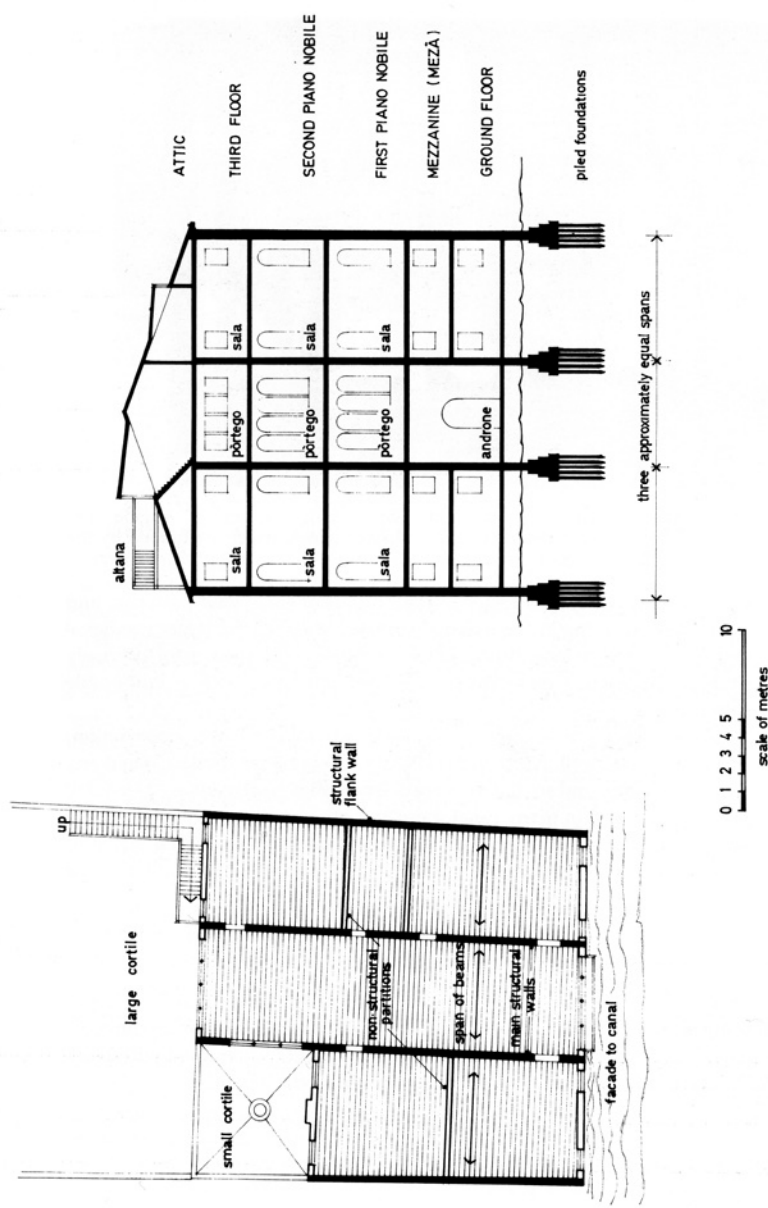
Plan (at first-floor level) and section of a typical Venetian palace, from Richard J. Goy, *Venetian Vernacular Architecture* (Cambridge, 1989).
